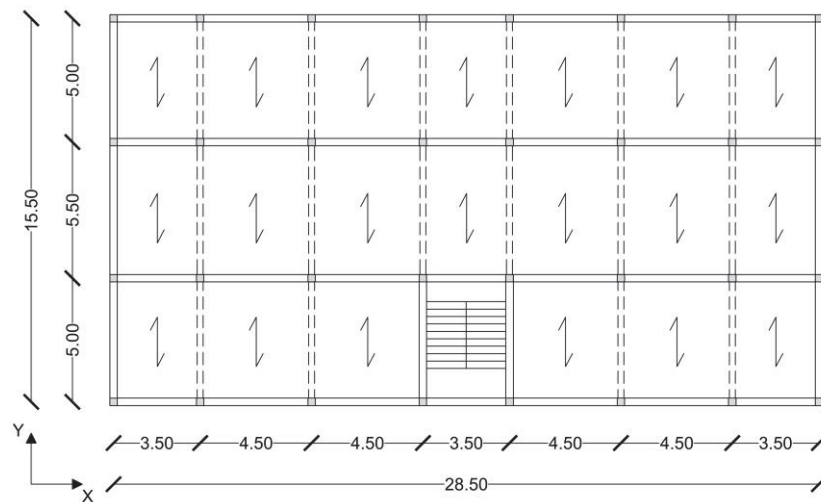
Assumed plan layout (dotted, the bond-beams in the Y direction).
